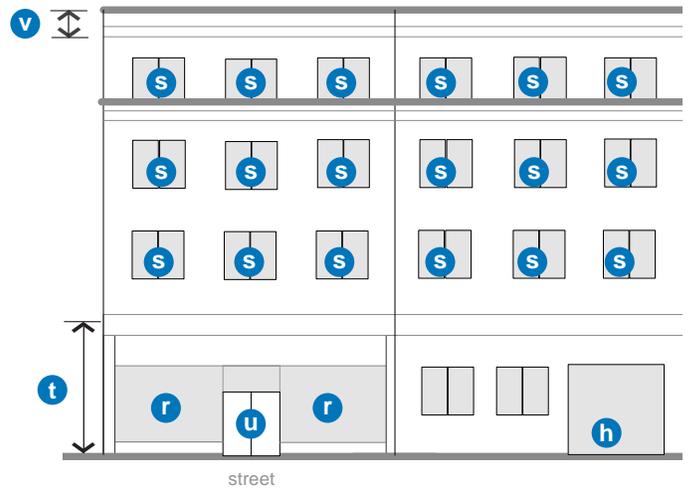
(3). Limited Bay Building: Street Façade Requirements.
